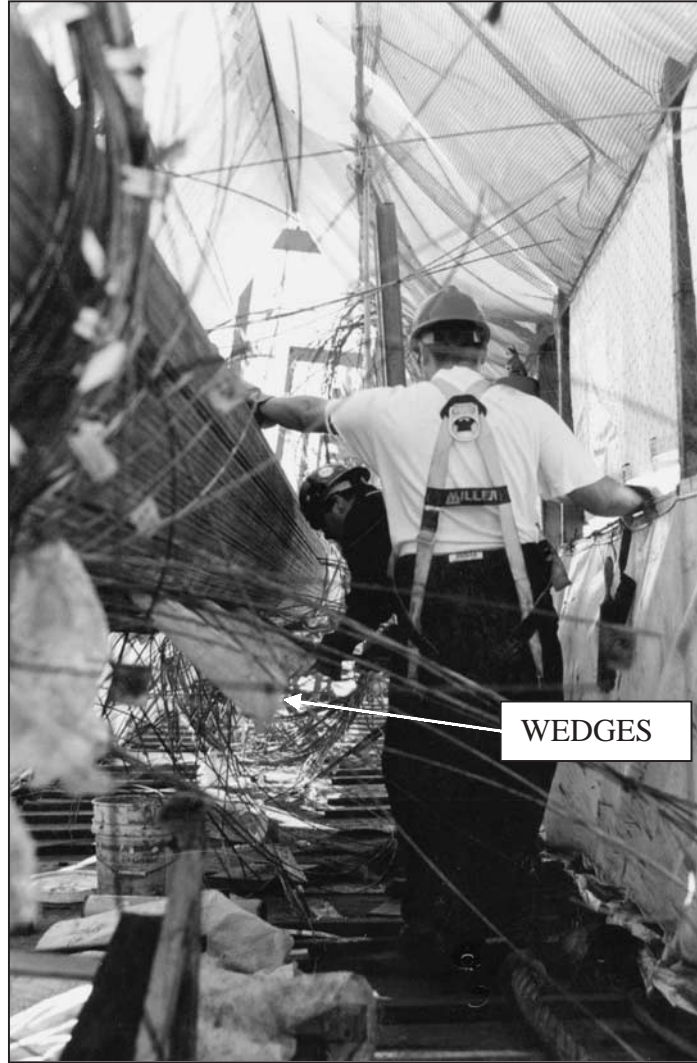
Additional wedges to inspect area with many broken wires.
